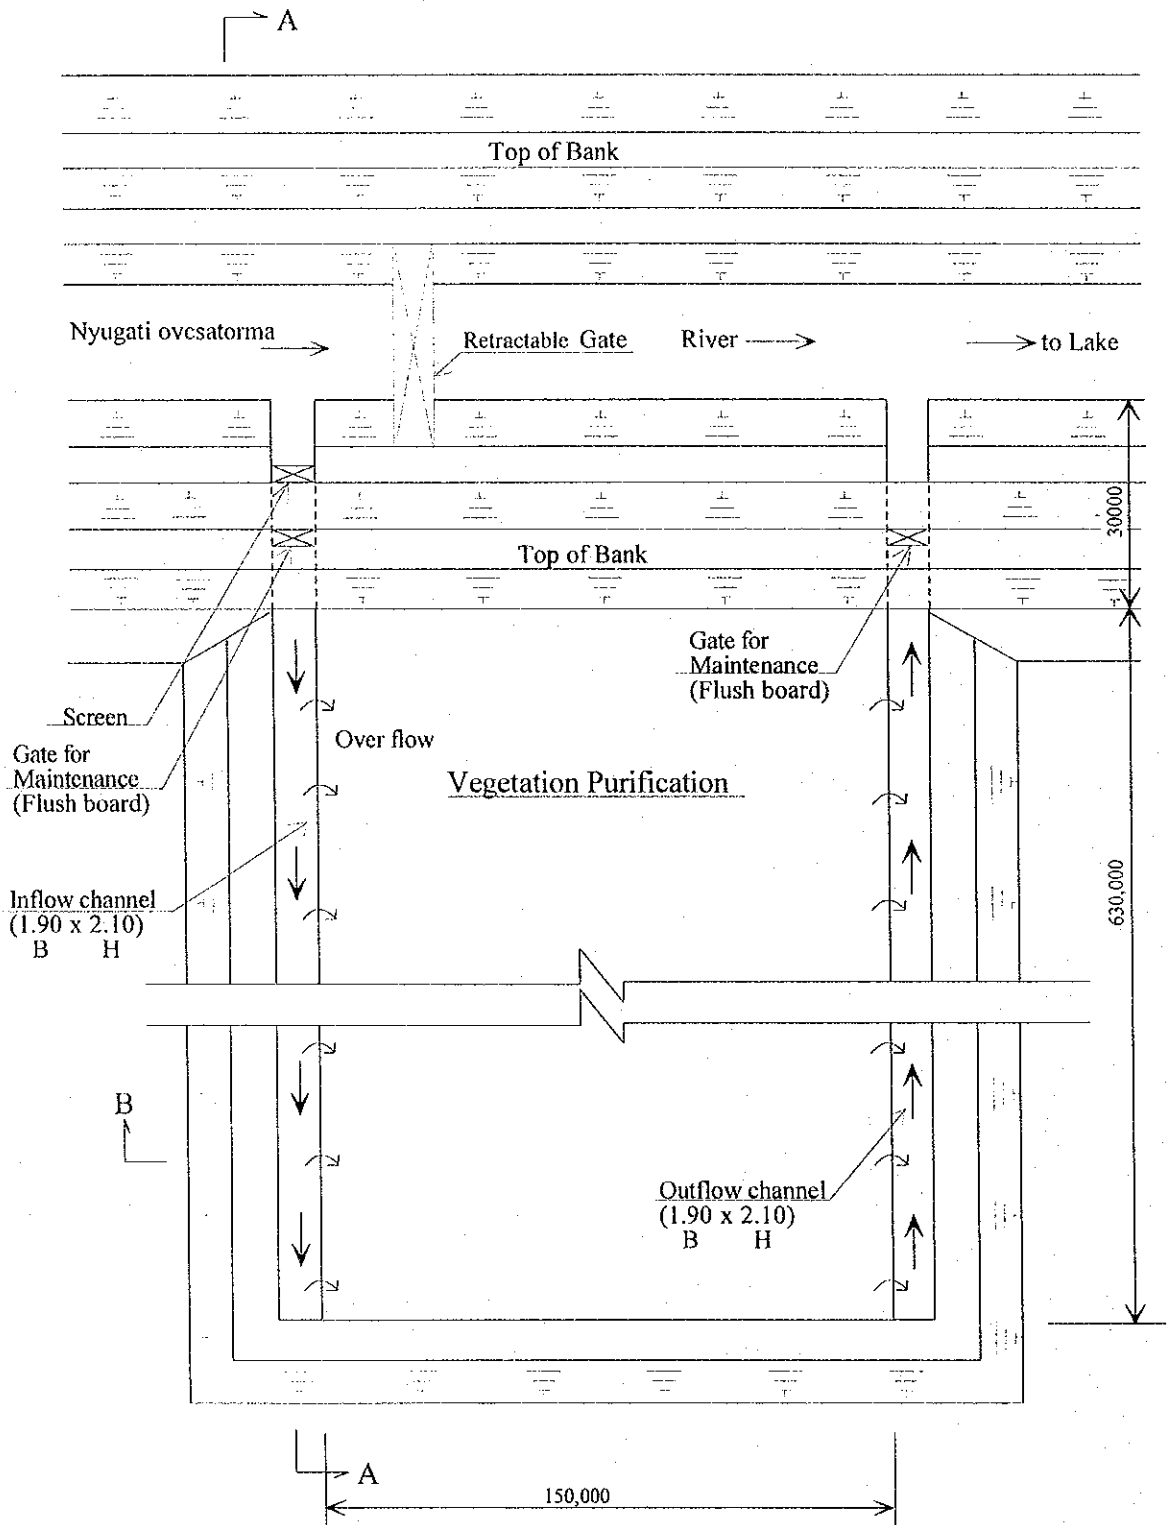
General Layout of Nyugati-ovcsatorna Facility
